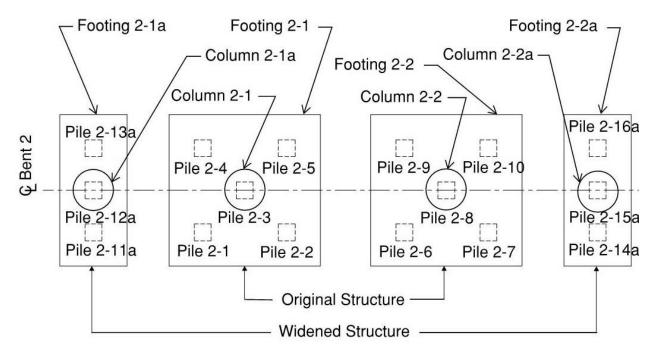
Labeling Convention for Widened Substructure with Added Piles
